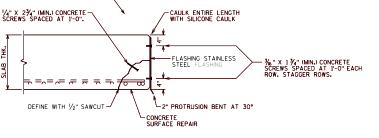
DETAIL FOR CONCRETE SLAB BRIDGE SIMILAR
